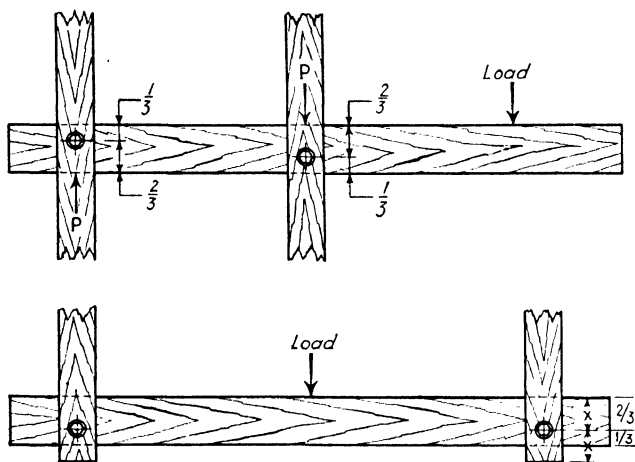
Proper method of locating bolts in spauls and hangers.
